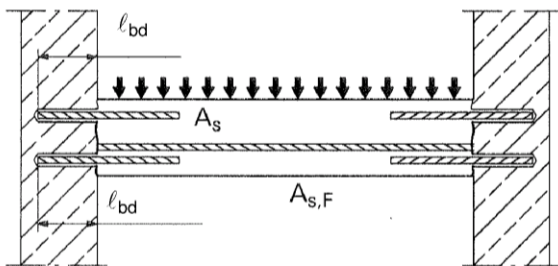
Overlapping joint for rebar connections of slabs and beams
